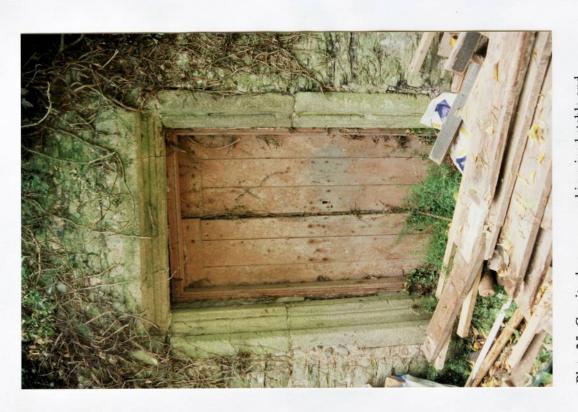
Granite door surround in ruined stable and coach house, looking south.
